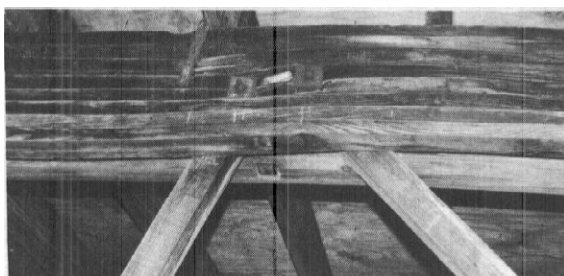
(C) Failure of top chord due to decay. Roof leaks were obviously present prior to replacement of the roof.
